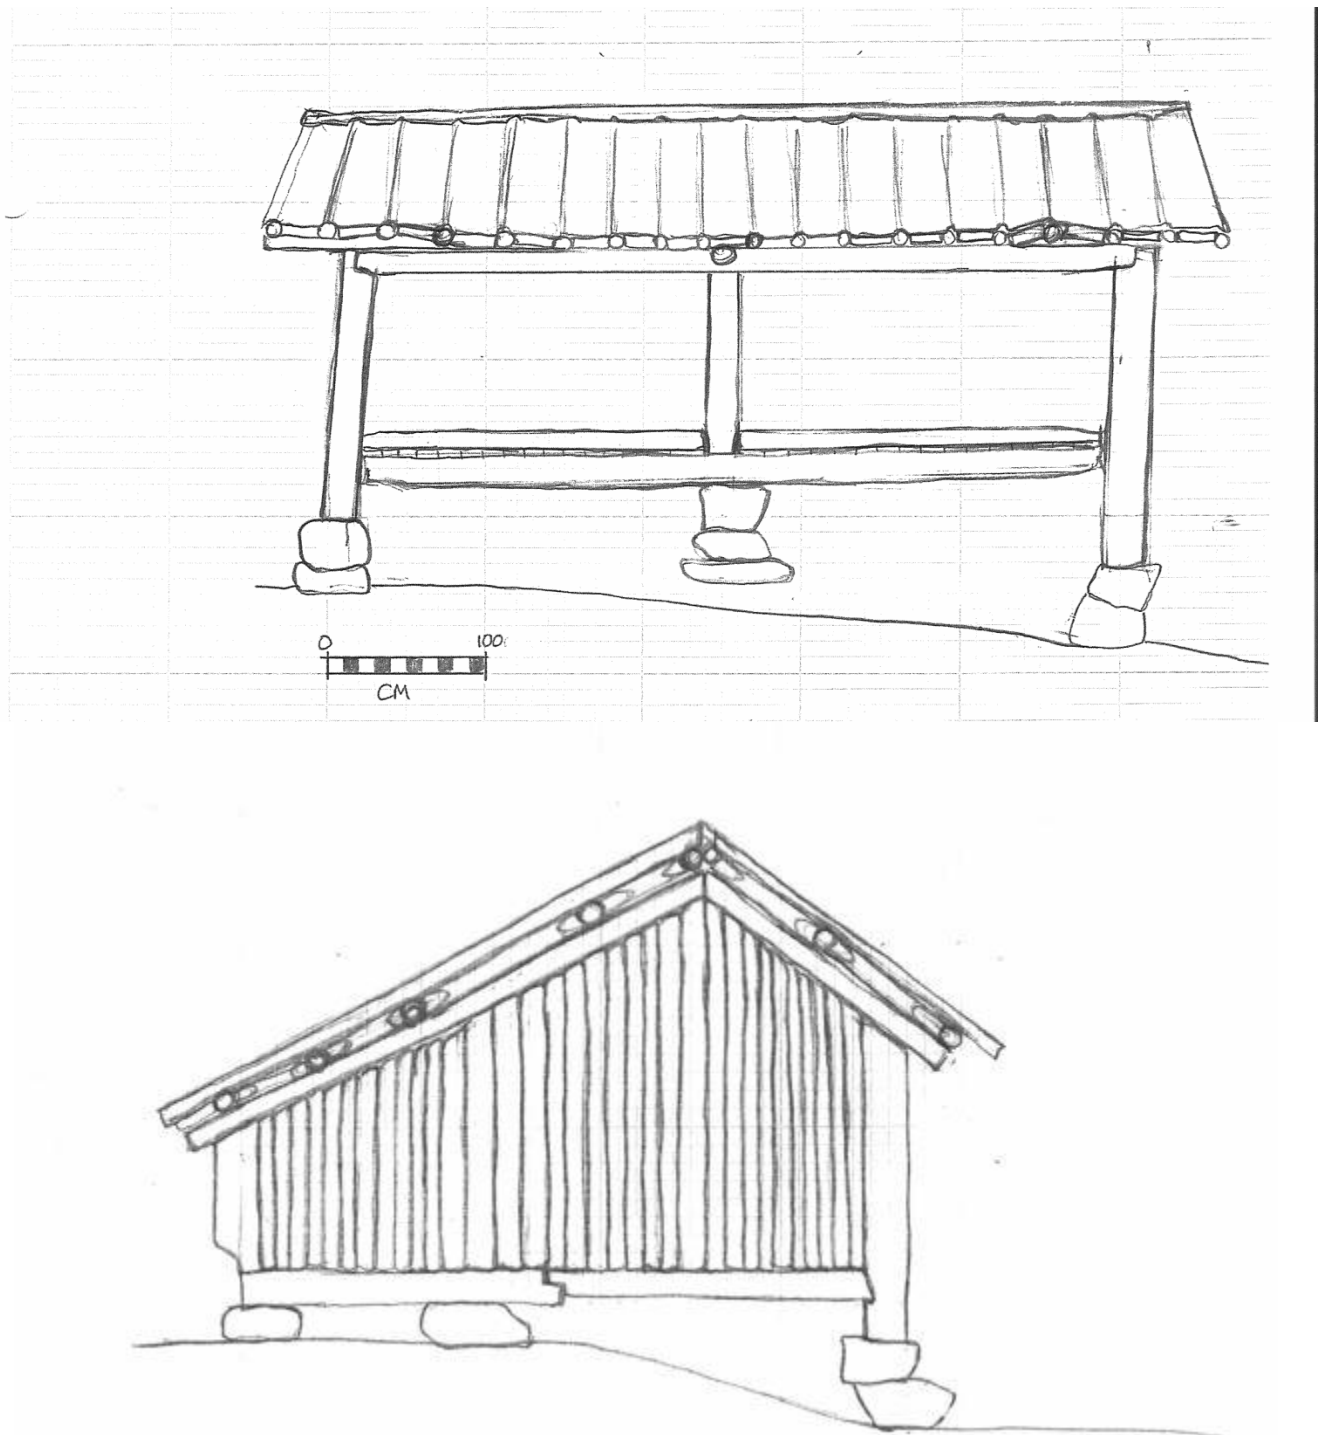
Ethan Pond shelter. Above: West (front) façade. Below: North side elevation. June 16, 2011.
